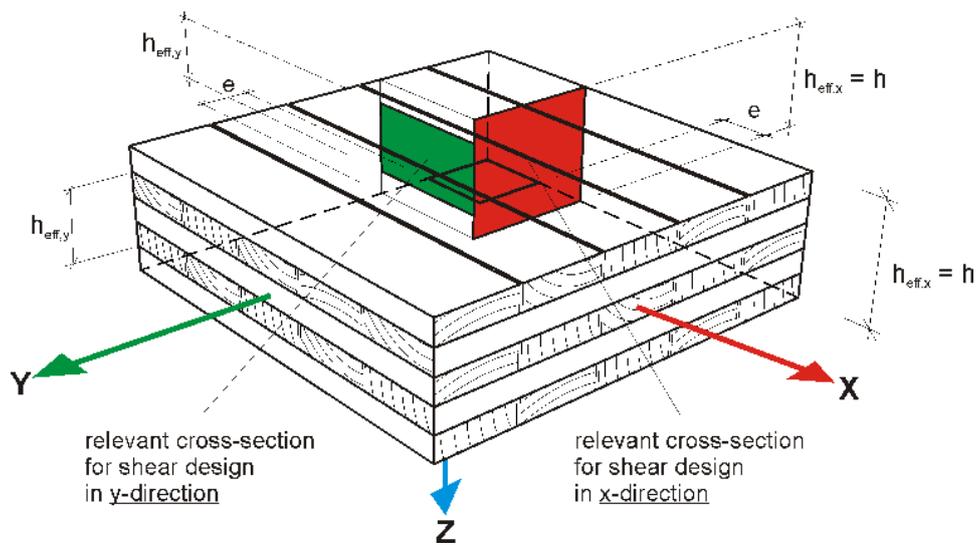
Relevant cross sections for shear stress verification – example of a point support at a corner
